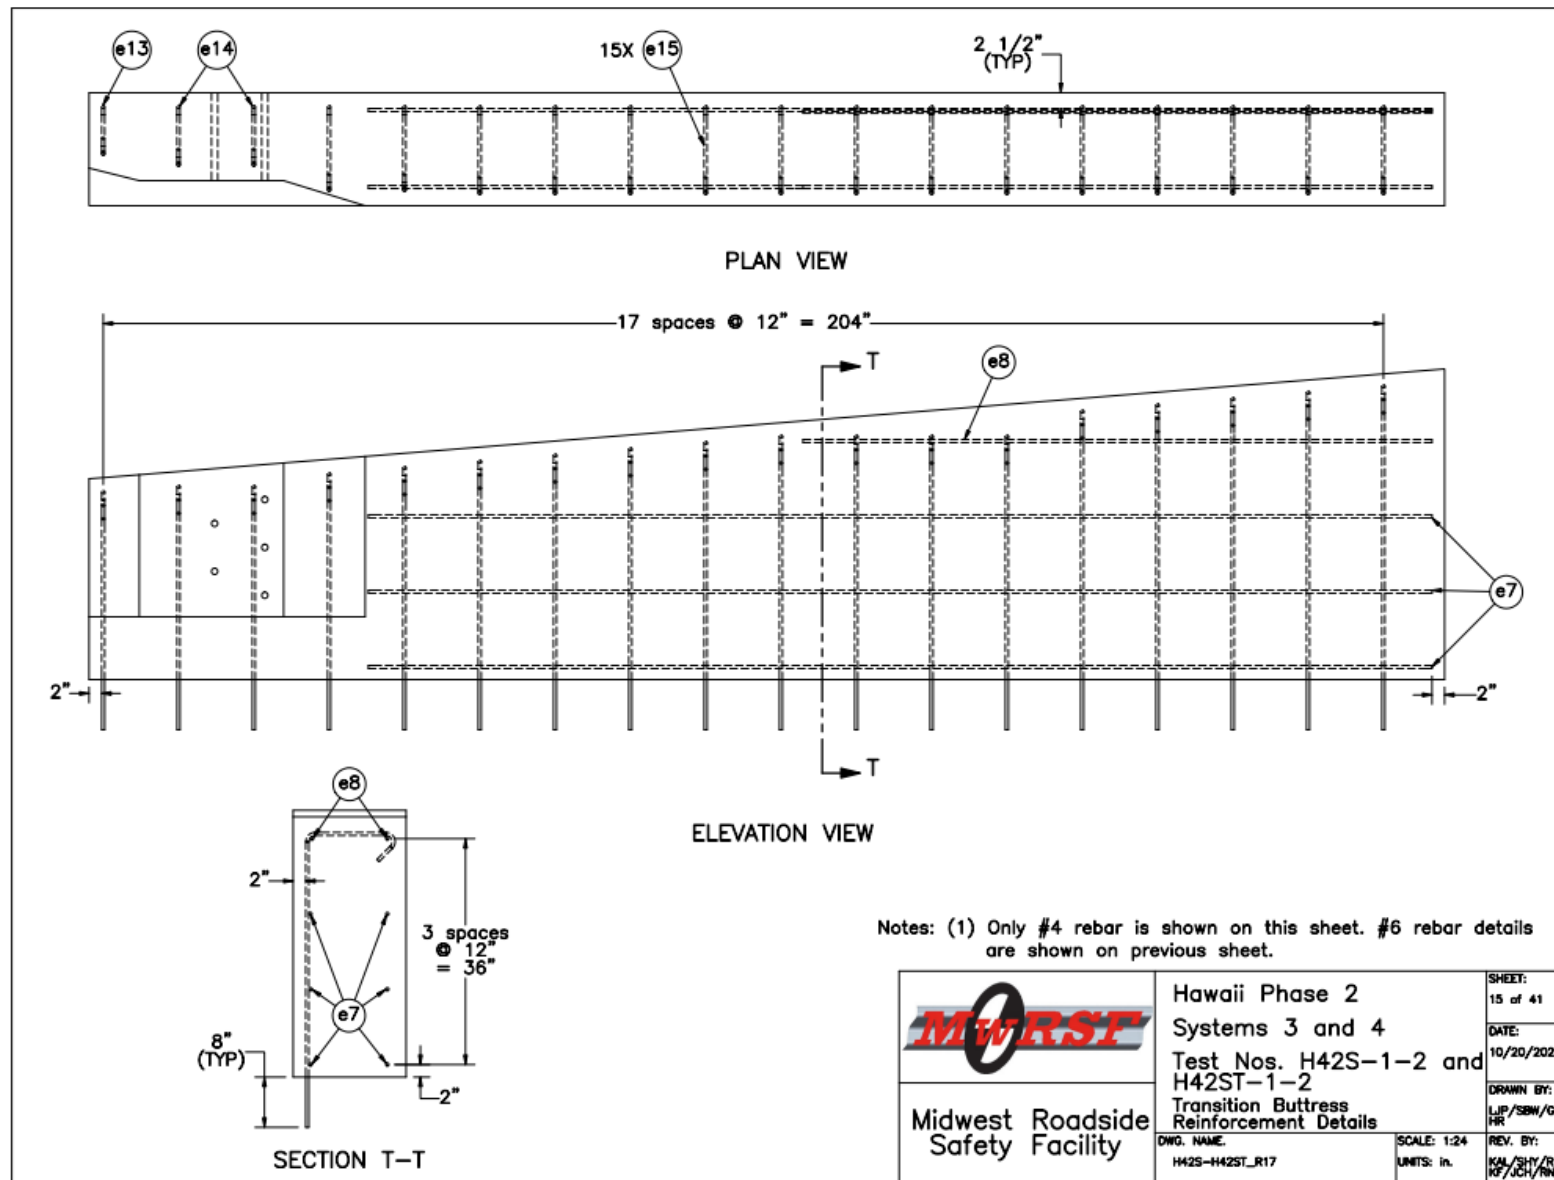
Transition Buttress Reinforcement Details, Test Nos. H42ST-1 and H42ST-2
